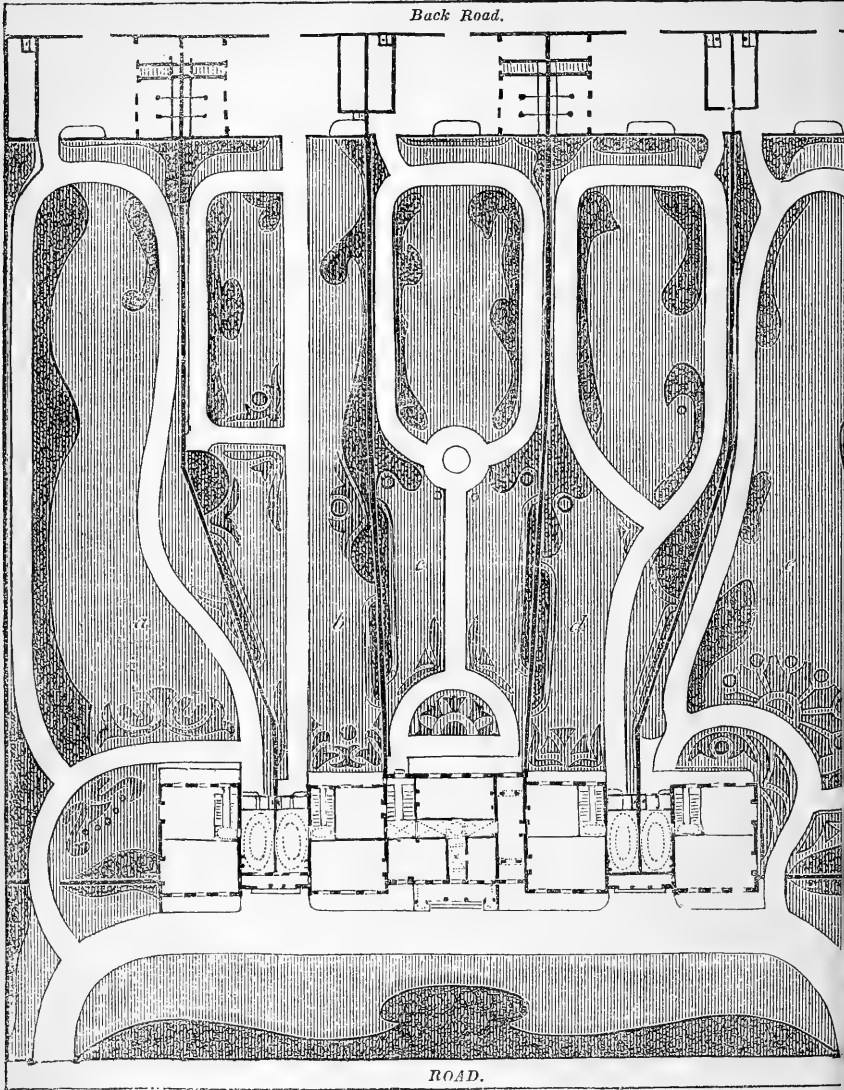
General Ground Plan of Five Suburban Dwellings with their Gardens.
